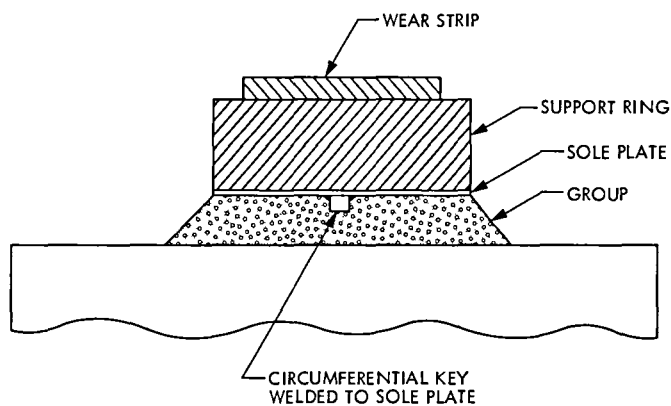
Cross section of track showing addition of sole plate keyed to grout, method 2
